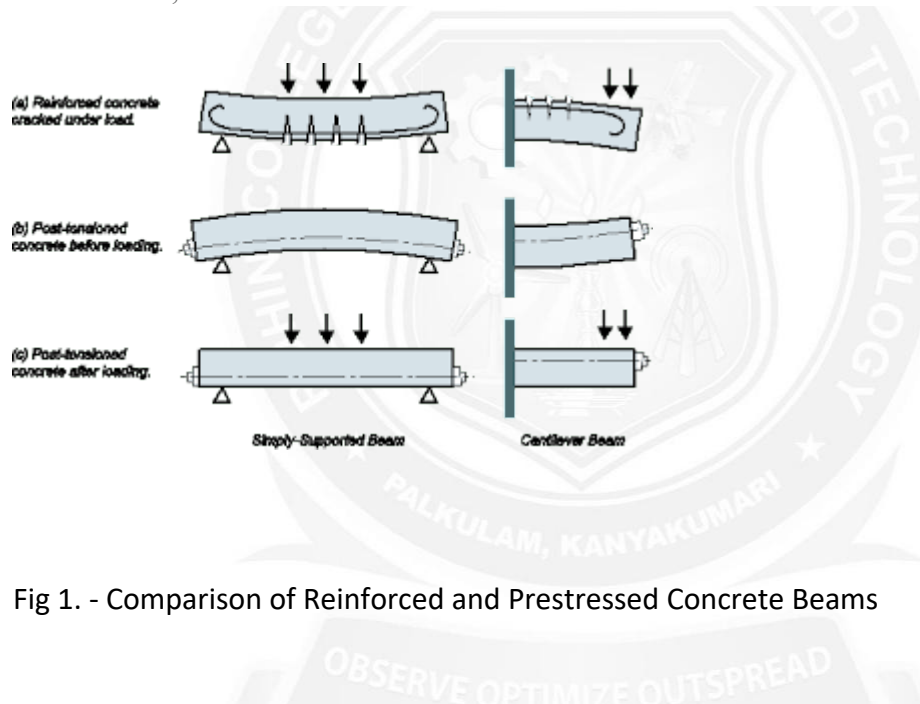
Comparison of Reinforced and Prestressed Concrete Beams
